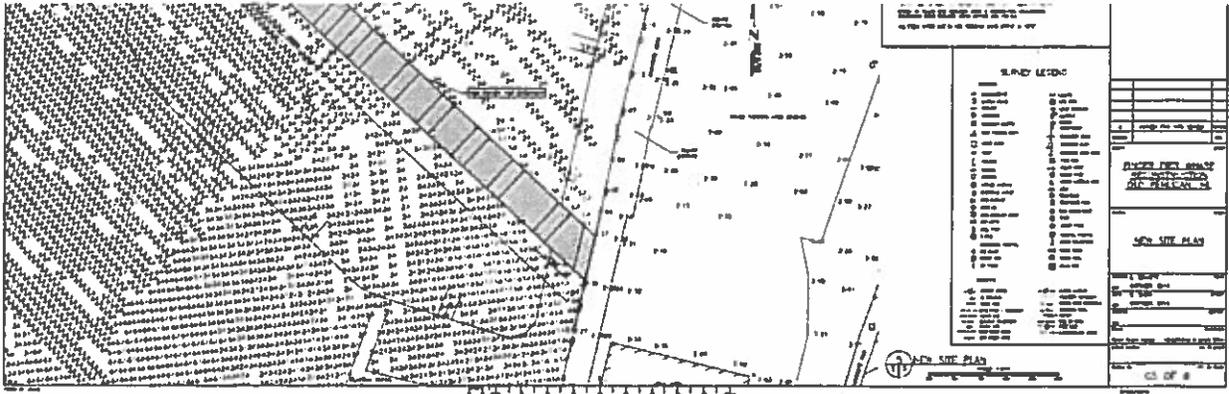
Old Perican Site Plan indicating proposed wharf footprint
